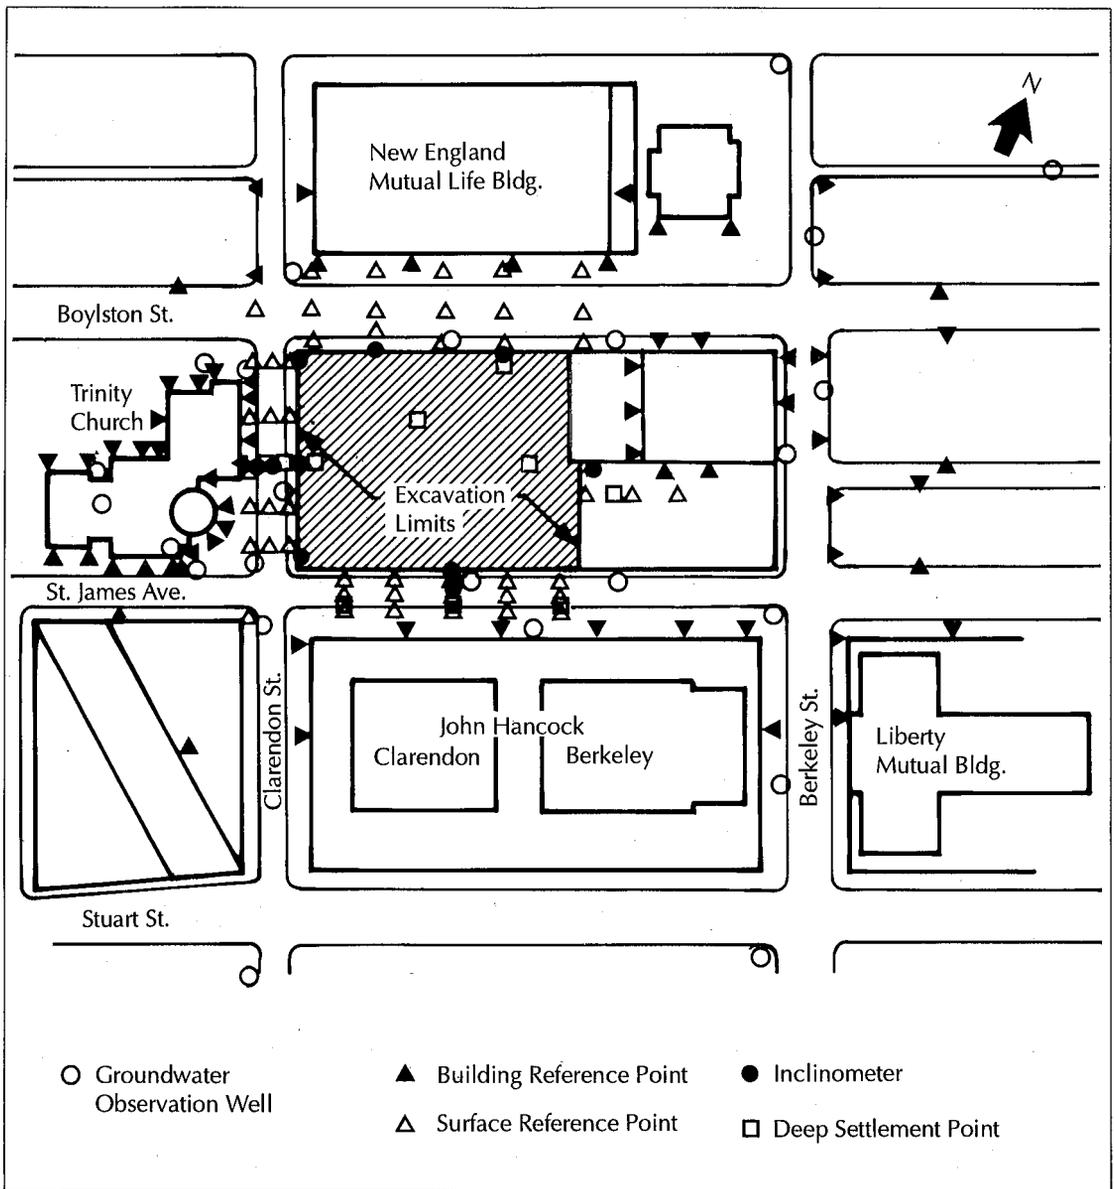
The instrumentation location plan for the 500 Boylston Street project.
